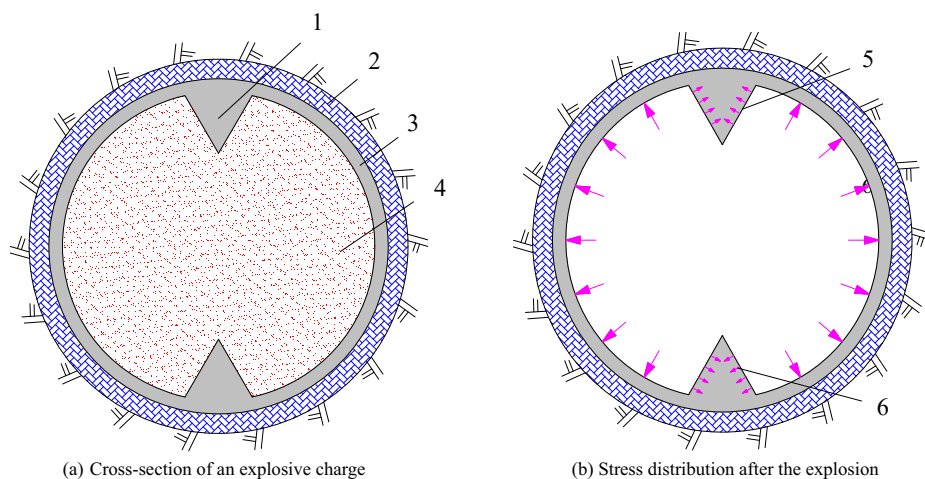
Schematic of the controlled blasting device for the directional fracturing
